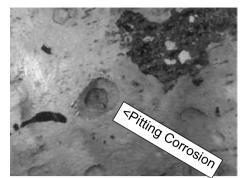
Pitting corrosion (Concrete exposed)
